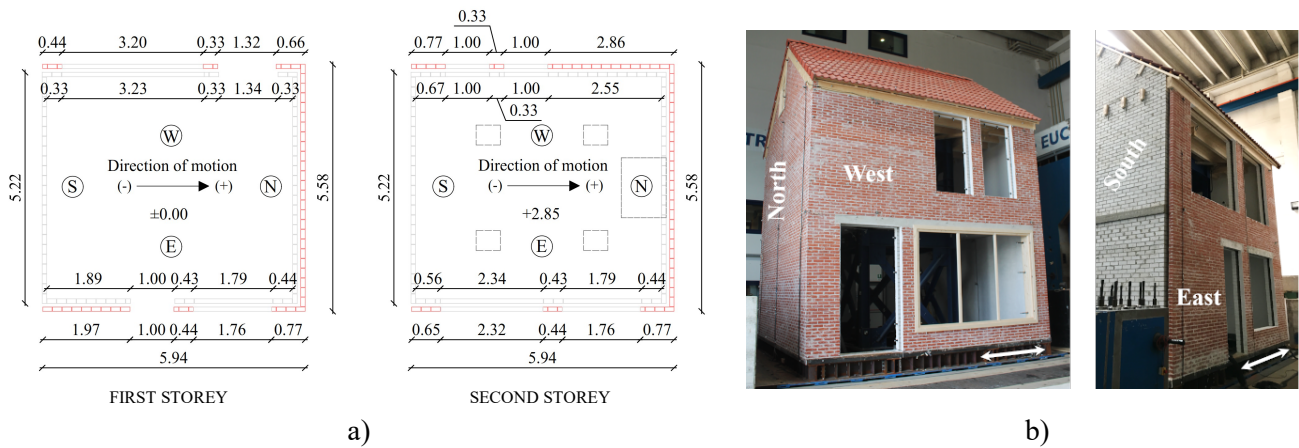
Bare building overview: a) plan views; b) overviews of the building prototype (white arrows indicate the shaking direction). Units of m.
